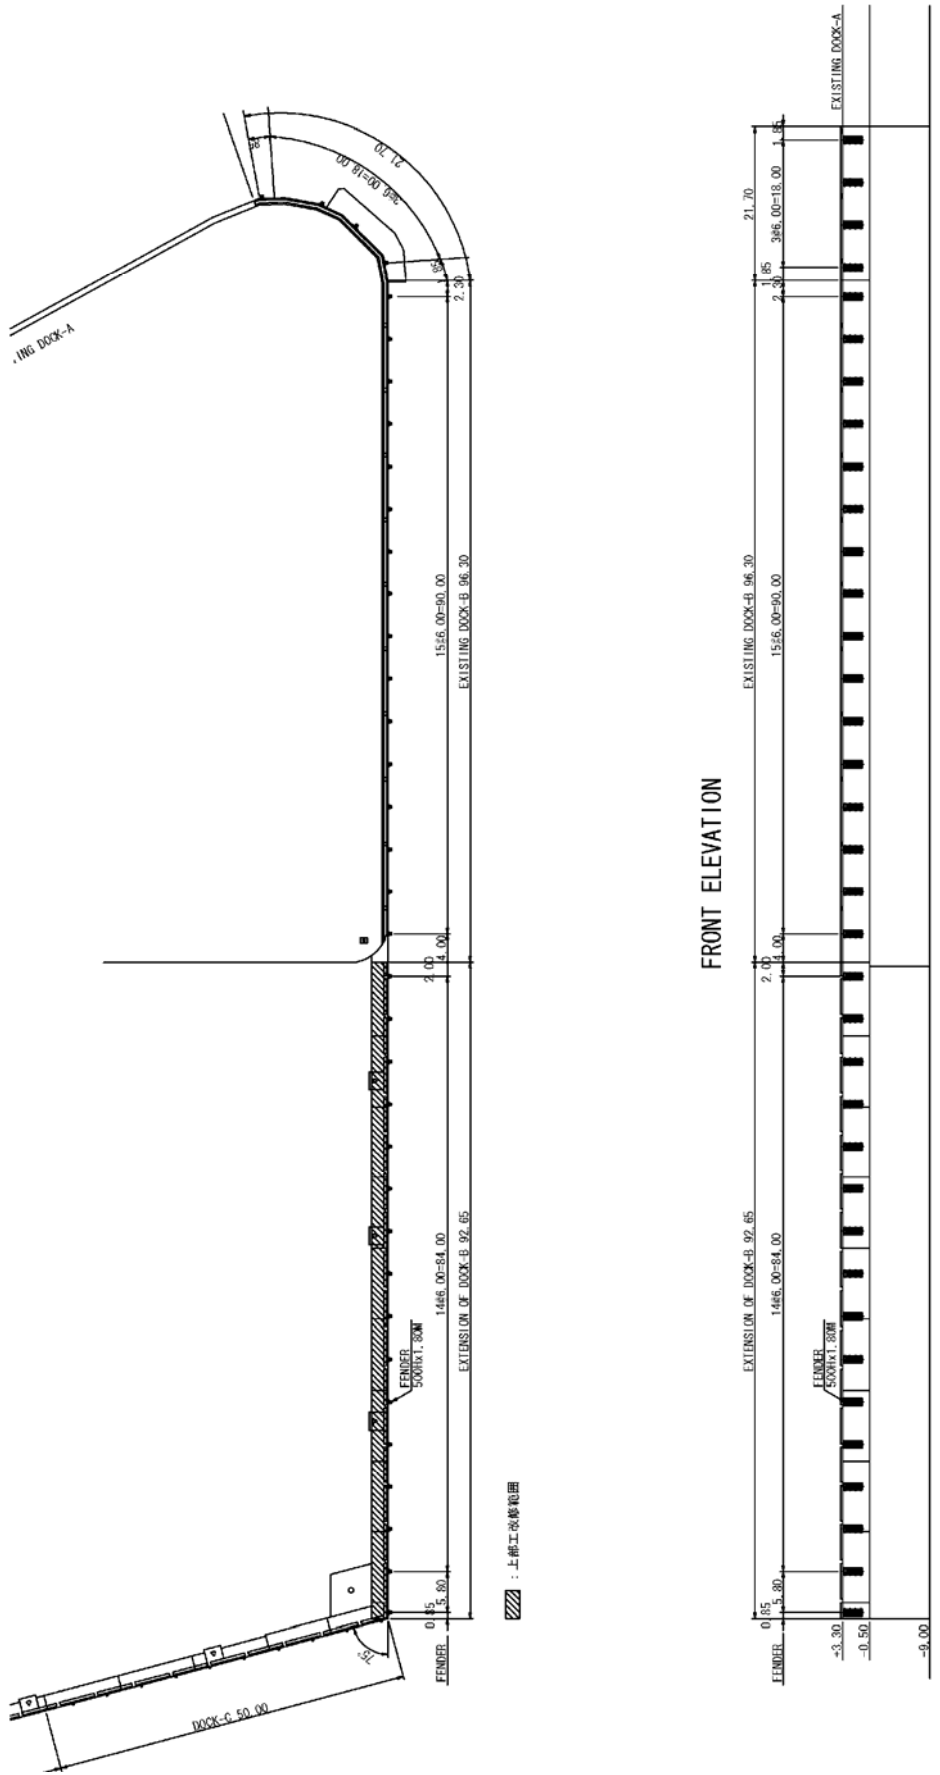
Plan of Improvement Rubber Fender : B Dock
